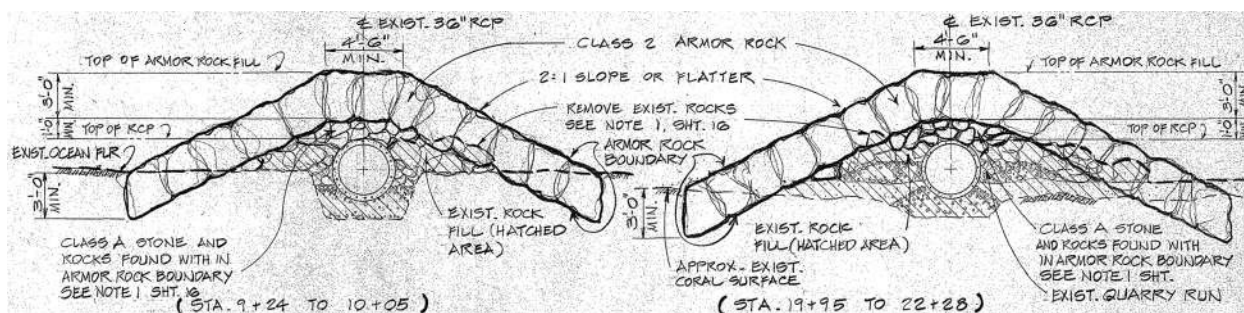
Ballast pile modifications, from 1986 as-built plans
